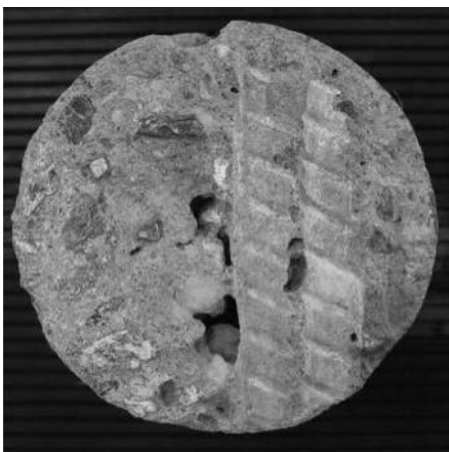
(c)—Evidence of entrapped air voids along the trace of lap-spliced reinforcement.
